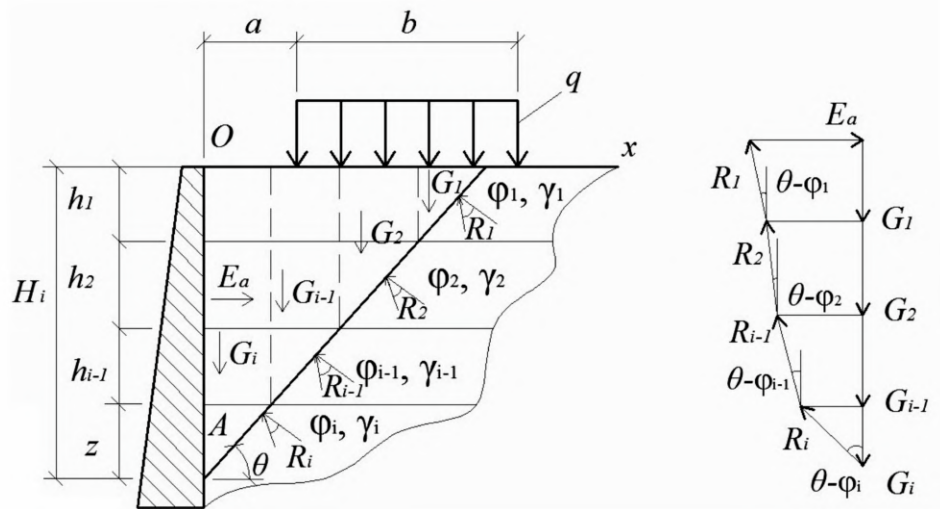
Design diagram of a retaining wall with multilayer backfill and surface load.
